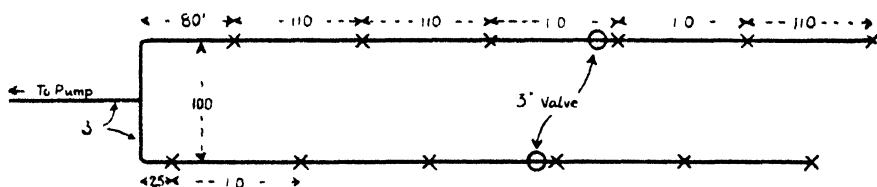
Plan of the Pipe line System installed at Ayr for Experimental Purposes.
